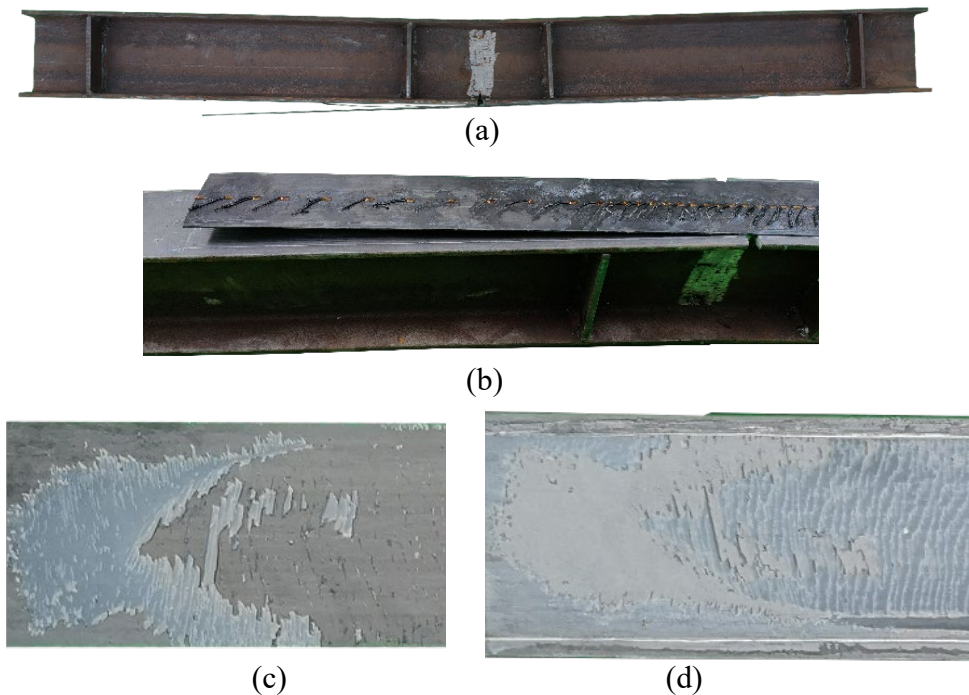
Typical failure mode of the CFRP-retrofitted steel beams: a) front view; b) close-up view of the debonded side; and close-up views of the debonded surface c) on the CFRP plate; d) on the substrate steel side.
